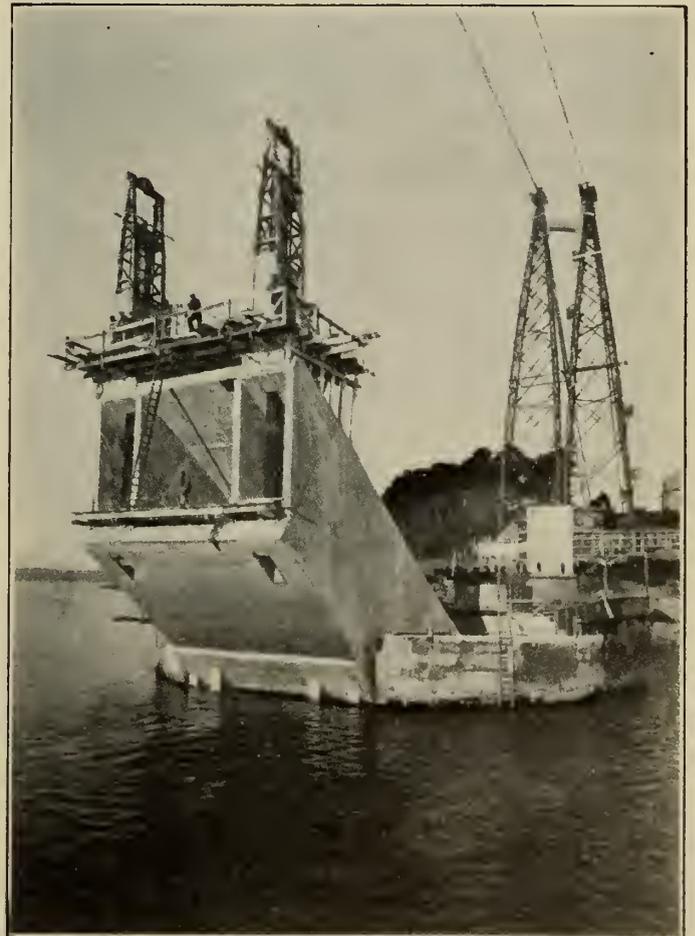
Brest abutment ready to receive the centring and showing cross section of arch.
